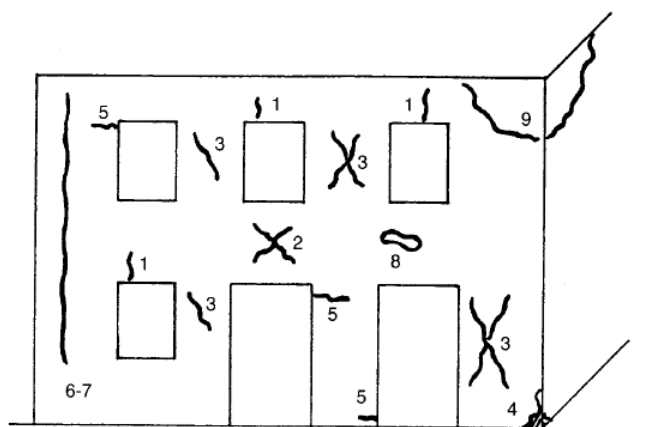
Damage Types in masonry bearing walls. 1 : *Vertical cracks in openings, 2 : Diagonal cracks on parapets, doors and window lintels, 3 : Diagonal cracks on vertical walls between openings, 4 : Local masonry crushing with or without “spalling”, 5 : Horizontal flexural cracks on top or bottom of vertical walls between openings, 6 : Vertical cracks at wall intersections, 7 : Passing through vertical cracks at wall intersections, 8: Spalling of material due to beam or floor pounding, 9: Separation and expulsion of two corner walls
